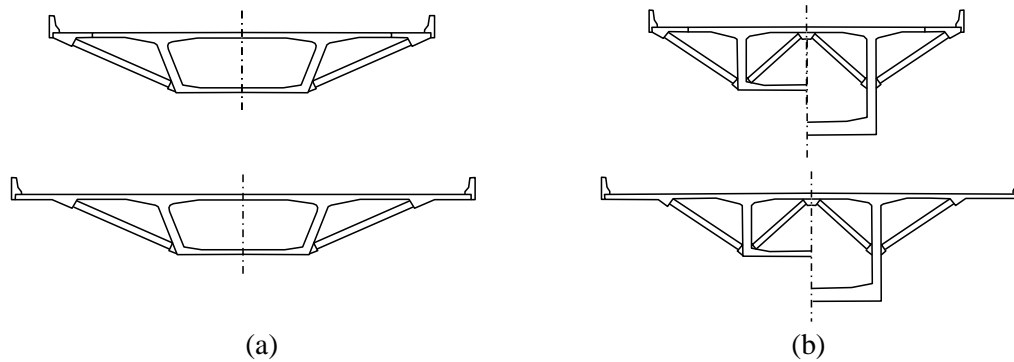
Cross-section widening of box girder with strutted wing slab (a) constant depth bridge [Shushkewich 2006] and (b) variable depth bridge [Shushkewich 2003]
